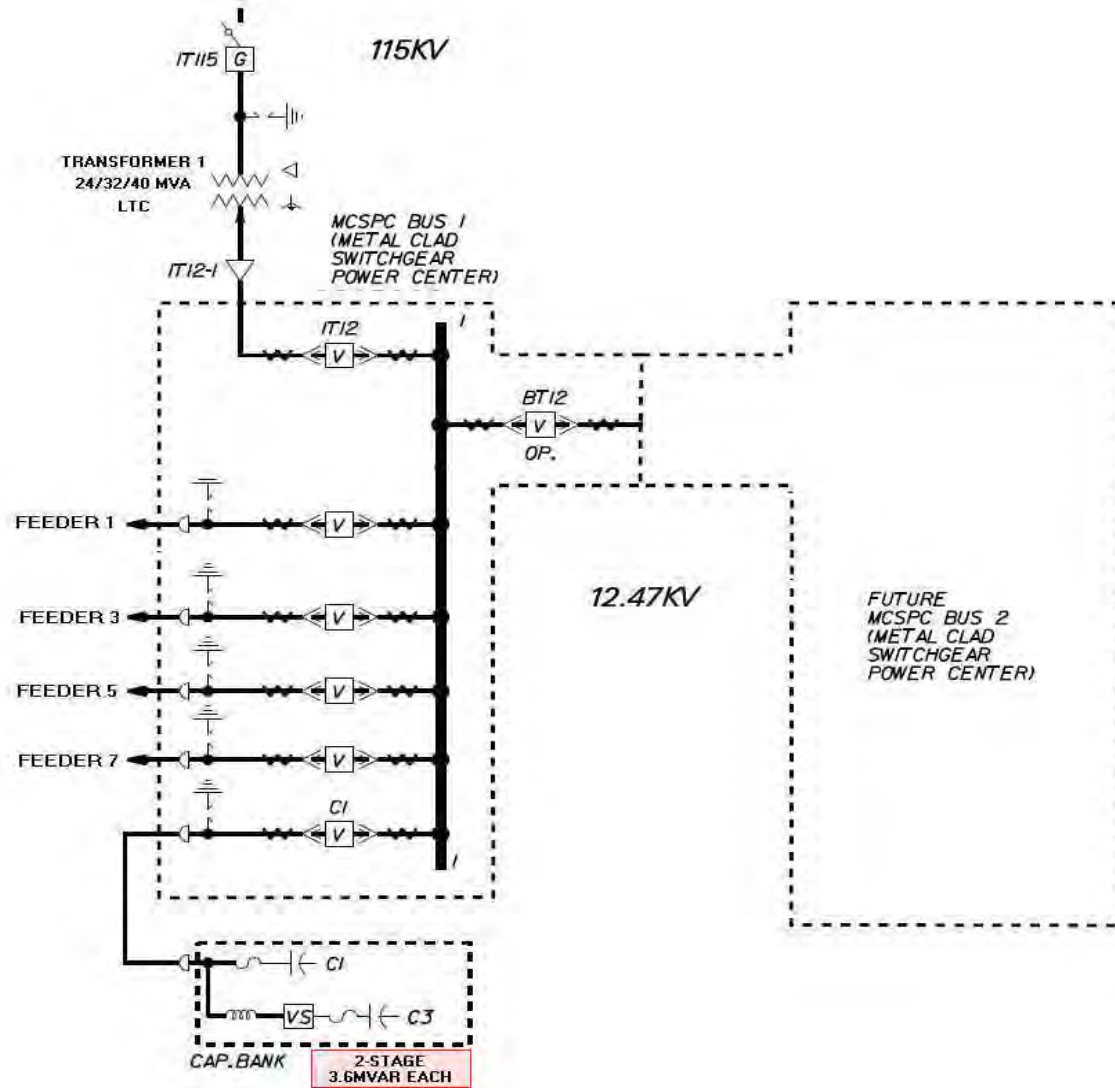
EAST PROVIDENCE SUBSTATION ONE LINE-DIAGRAM (PLAN 1)
